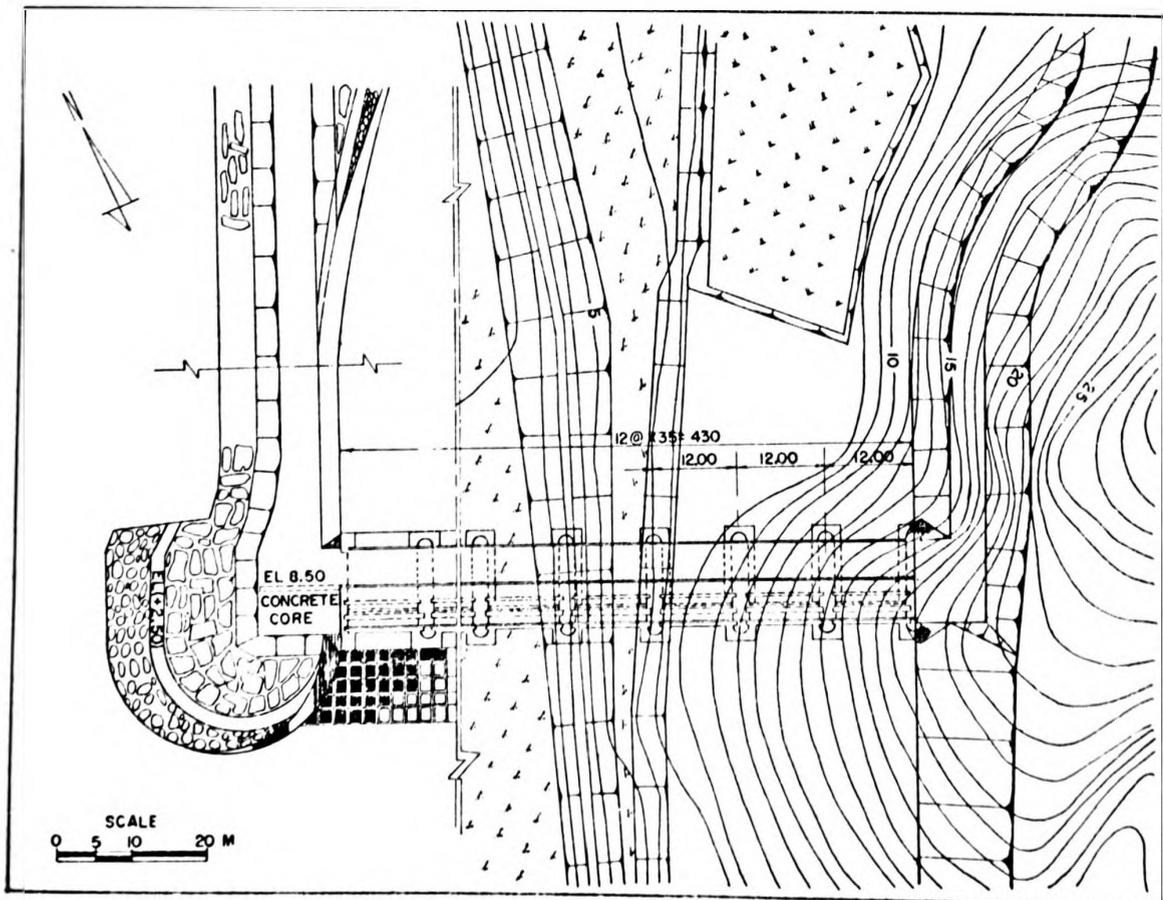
PLAN OF ANSONG CHON TIDAL GATE
